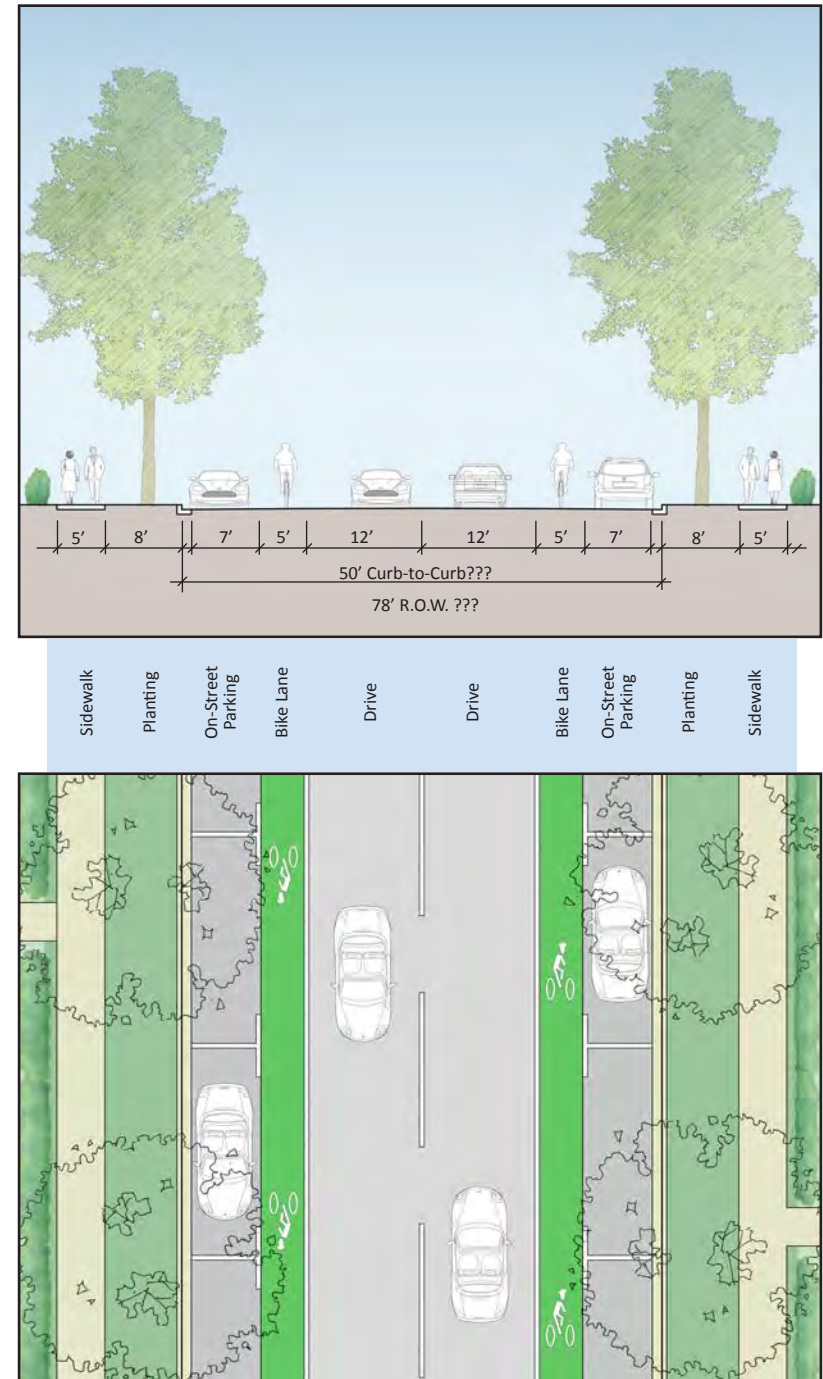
Street Sections – Illustrative Typical Section of Grace Street
